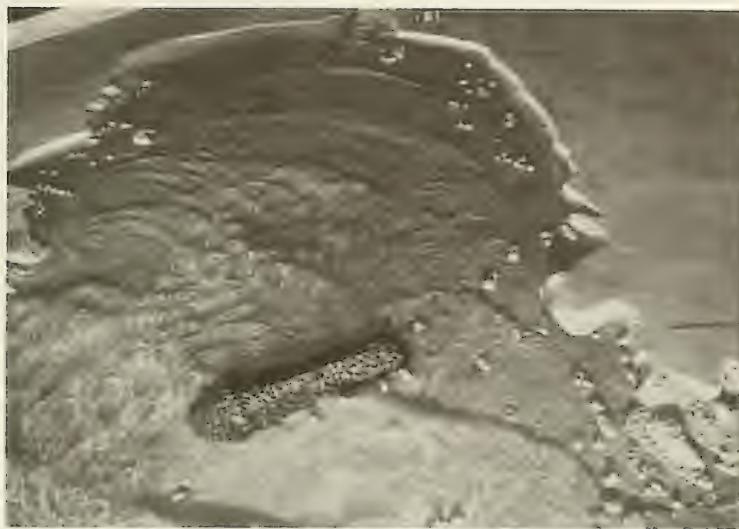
Typical wave patterns for the offshore breakwater plan; 15-sec, 14-ft waves from west-northwest; swl = 0.0 ft
